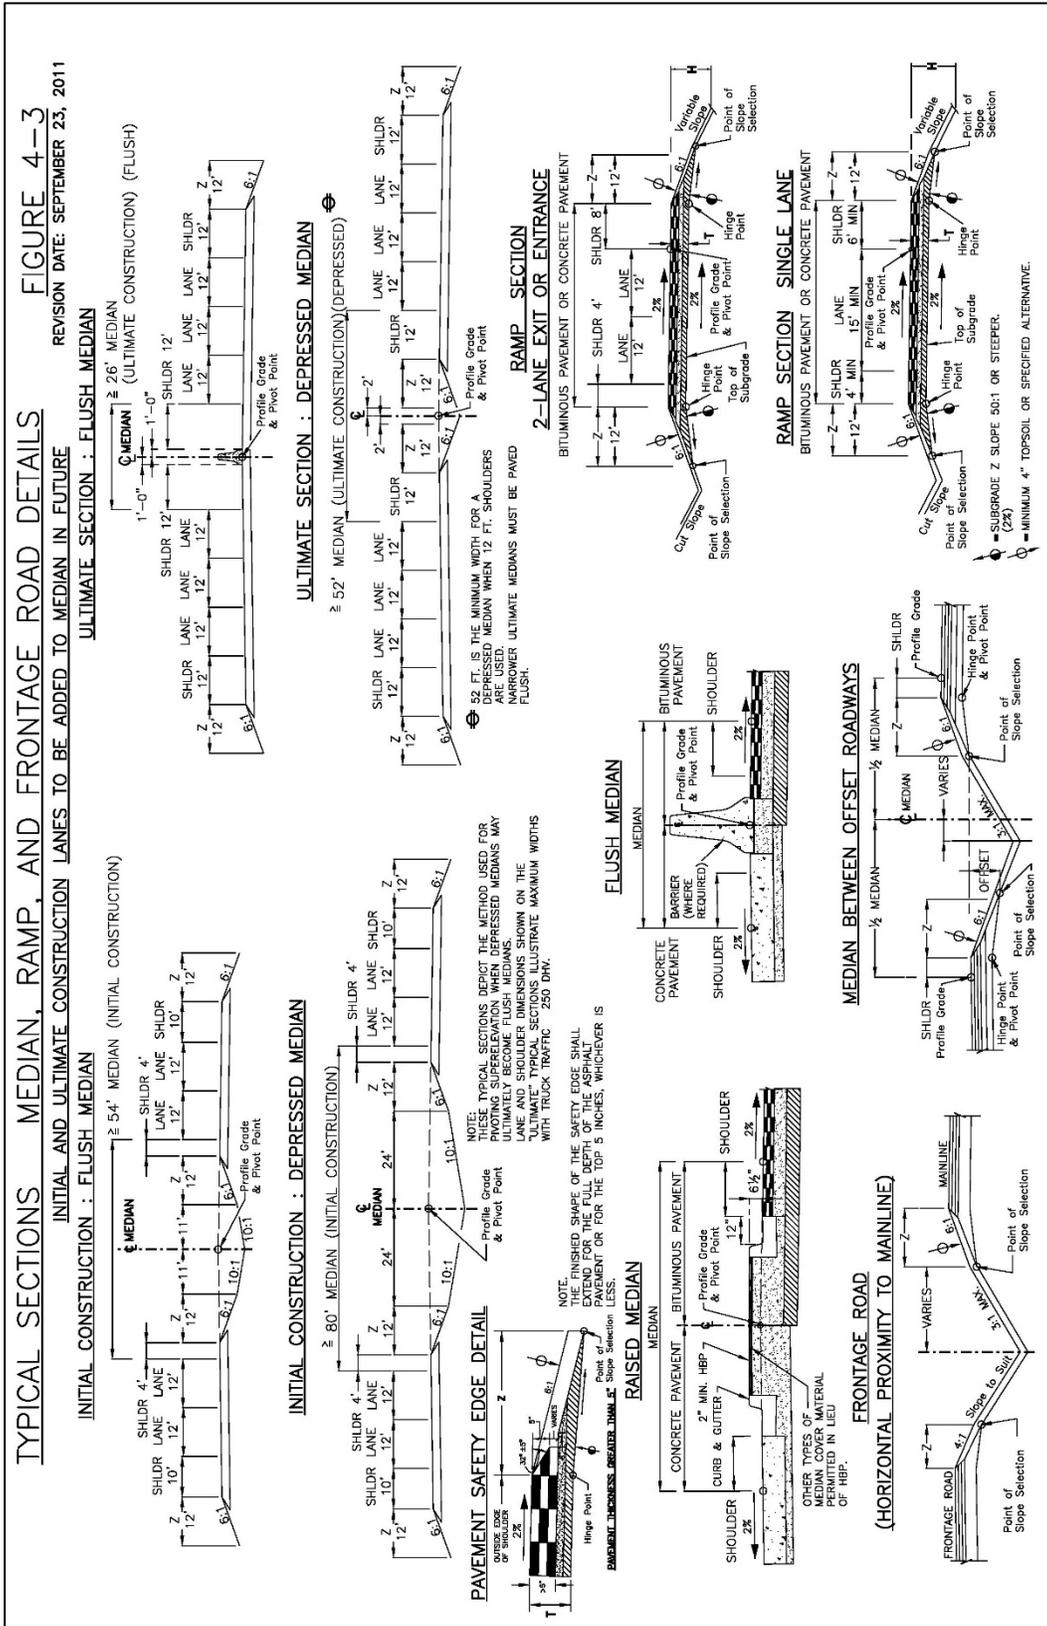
Typical Sections for Medians, Ramps, and Frontage Roads
